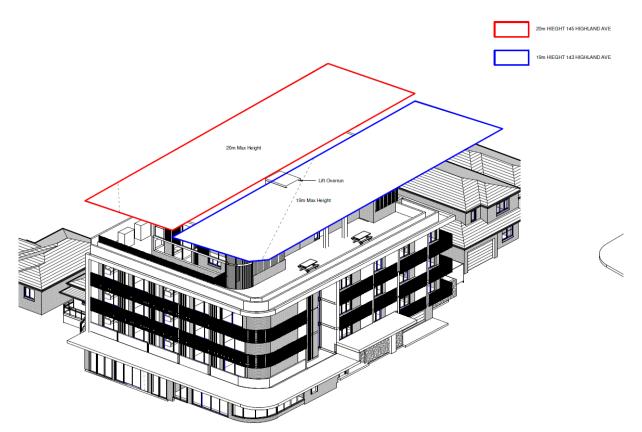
Extract of Height Blanket (Sheet No. 22 of the architectural plans prepared by Pagano Architects)
